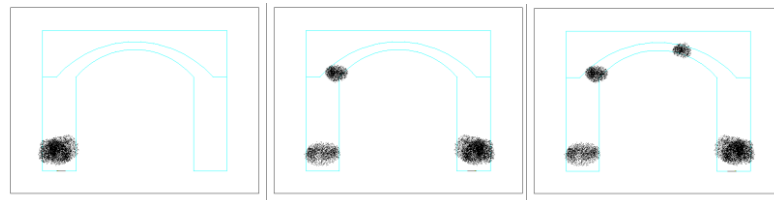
(d). Crack pattern for pier heights 7 to 8 meters
